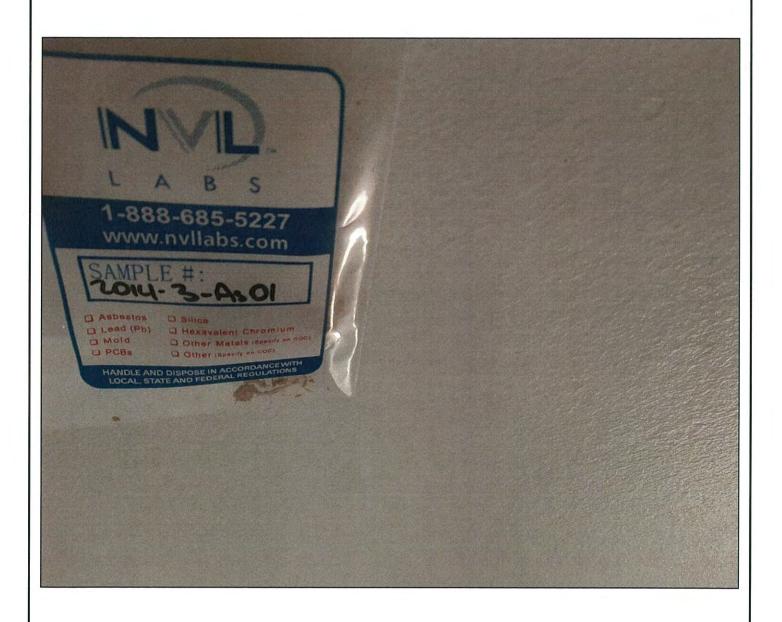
Canec ceiling panels Sample IDs 2014-2-As01
